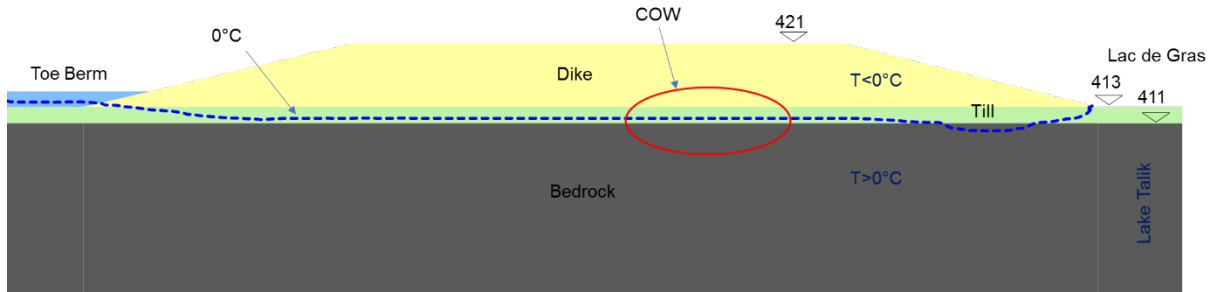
Cross section at ~ Sta. 1+550, 4.5 years after dike level at 421.
